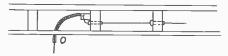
ENCLOSED KNOB AND TUBE WORK
